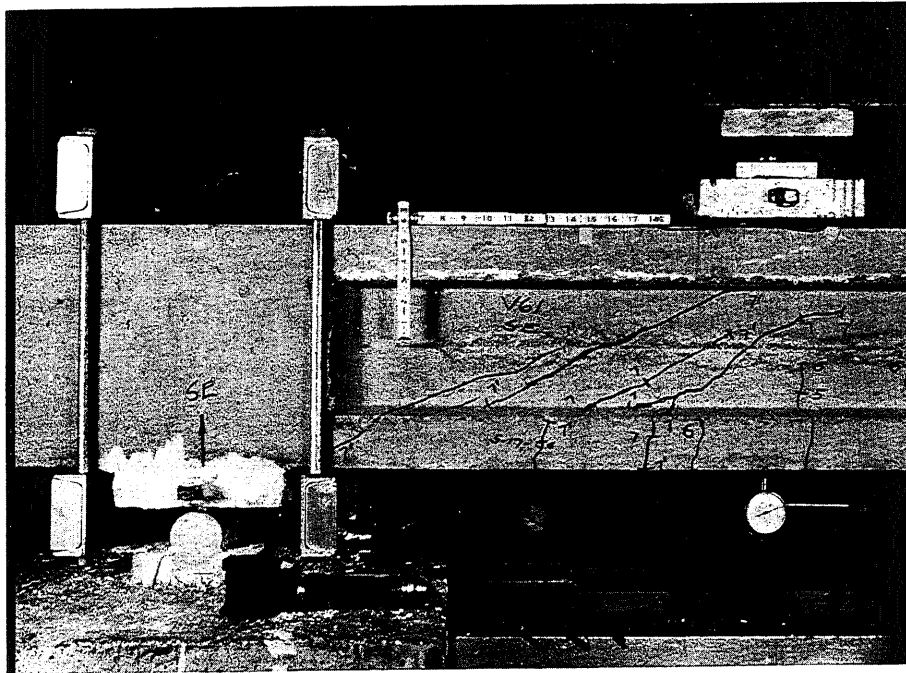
INCLINED TENSION CRACKING IN BEAM B.13.41
